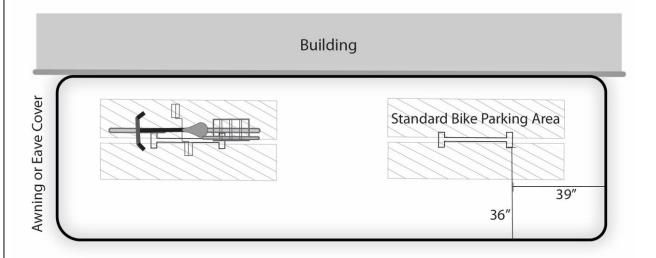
C.10.b. Covered Bike Parking Layout
